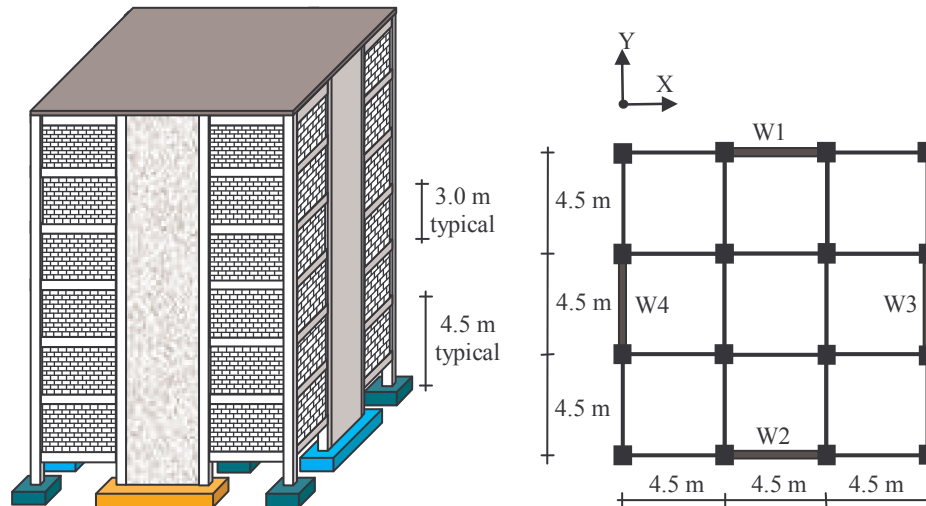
Six-storeyed RC frame-wall building, and typical floor plan.
